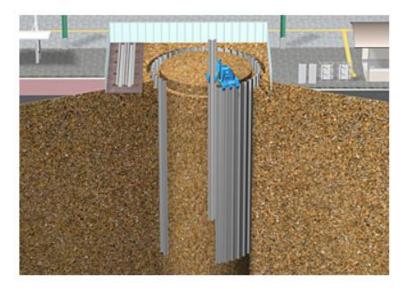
Installing a specially designed piles to form a cylindrical wall using Silent Piler
